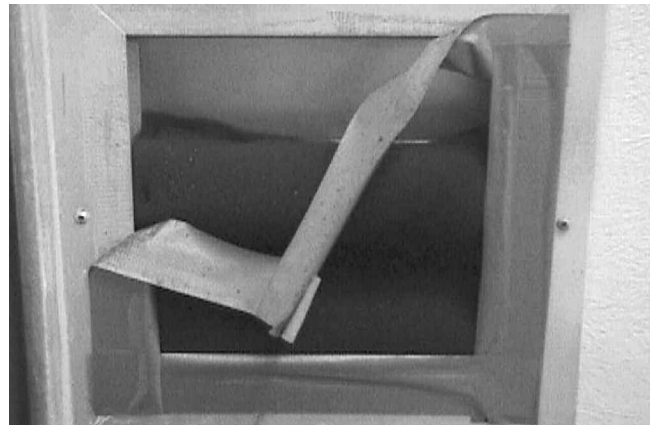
Damaged Air Filter on Building Housing Magnetic Bearing Controller.
